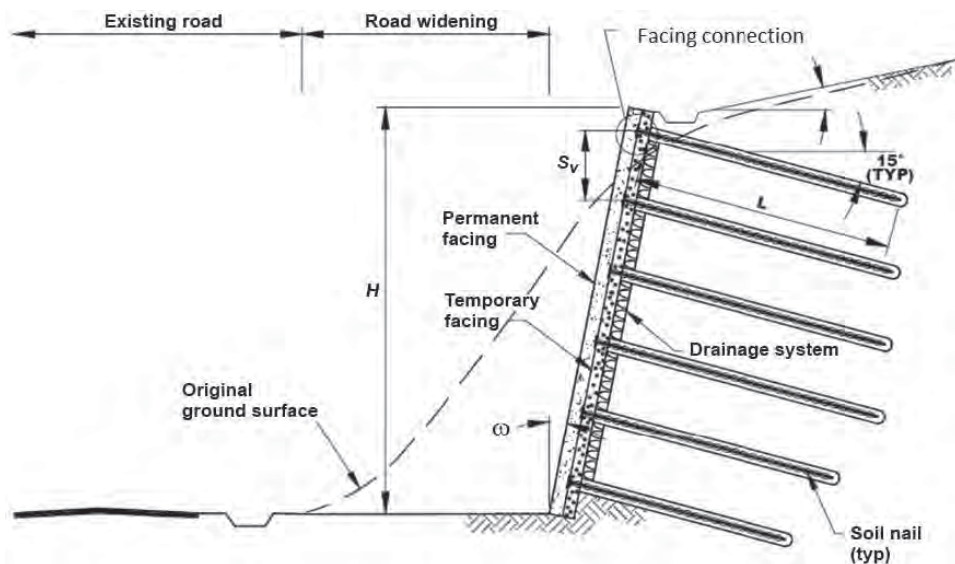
Typical cross section of soil nailing (Lazarte et al., 2003).
